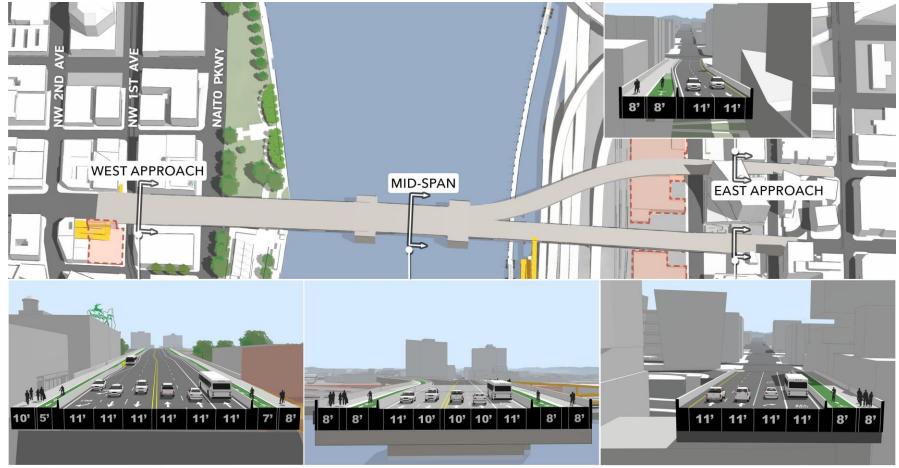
Replacement Alternative with Couch Extension – Cross Sections
